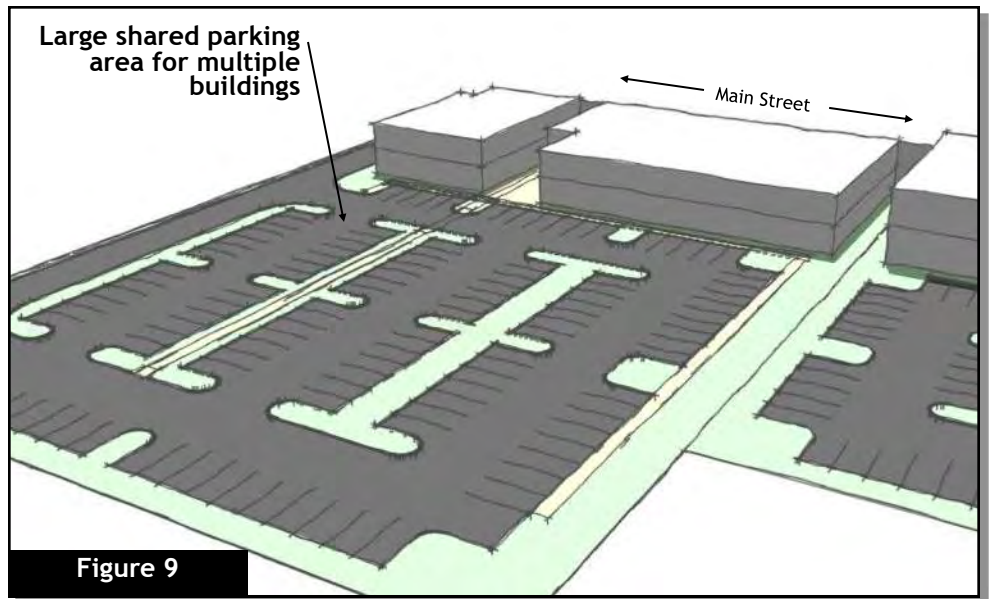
details a rear view of the shared parking complex as part of a larger development project with multiple buildings. The arrangement of the parking area and landscaping elements are covered in Sections D and E, respectively.
